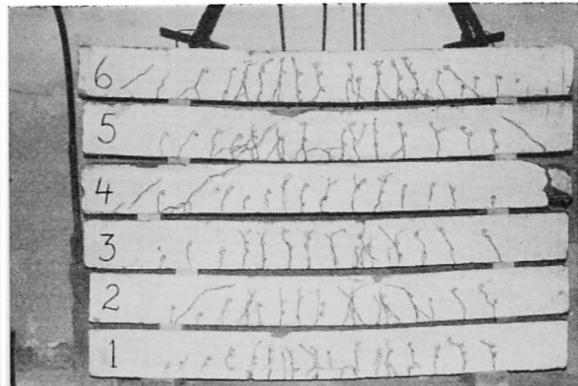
The beams are designed for the same load. 1 and 2 are made as in Fig. 4. 3 and 4 are not jointed. 5 and 6 are as shown in Fig. 4 welded together. The results were about the same for all beams.
